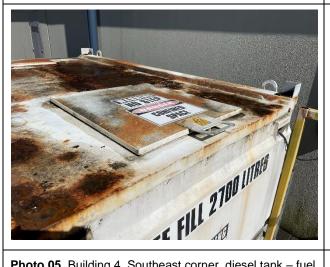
Building 4, Southeast corner, diesel tank – fuel tank.
